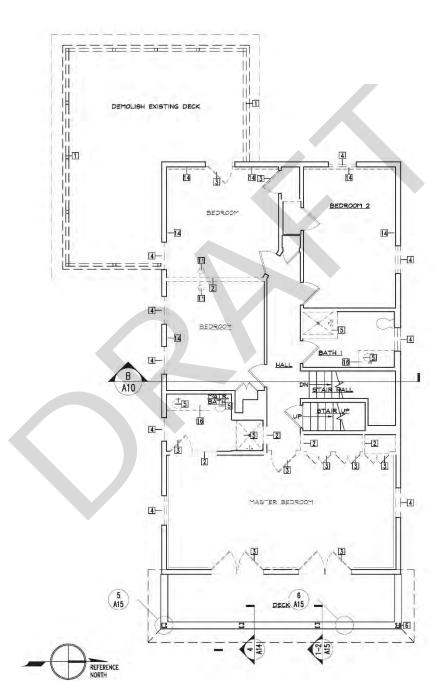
Second Floor Plan prior to restoration (ca. 2010) showing enlarged master bedroom at front and two bedrooms at rear (west) that now comprise the media room (Detail, Drawing A4, Gensler 2011)
